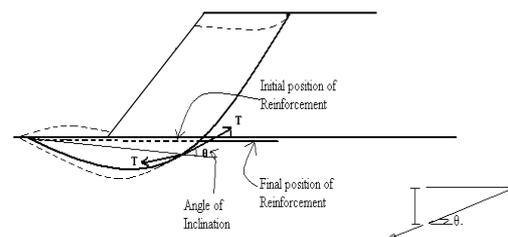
Basal reinforced embankment with oblique failure (Bergado et al. 2000)
